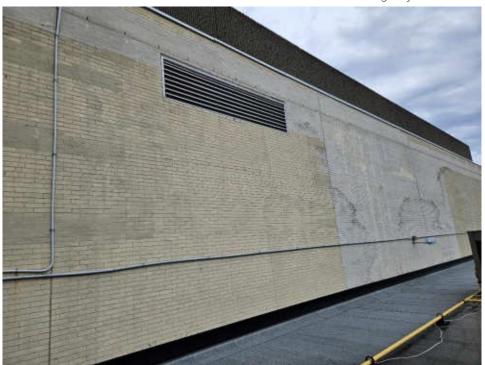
Partial Overview of West Elevation – From Main Mall Roof
